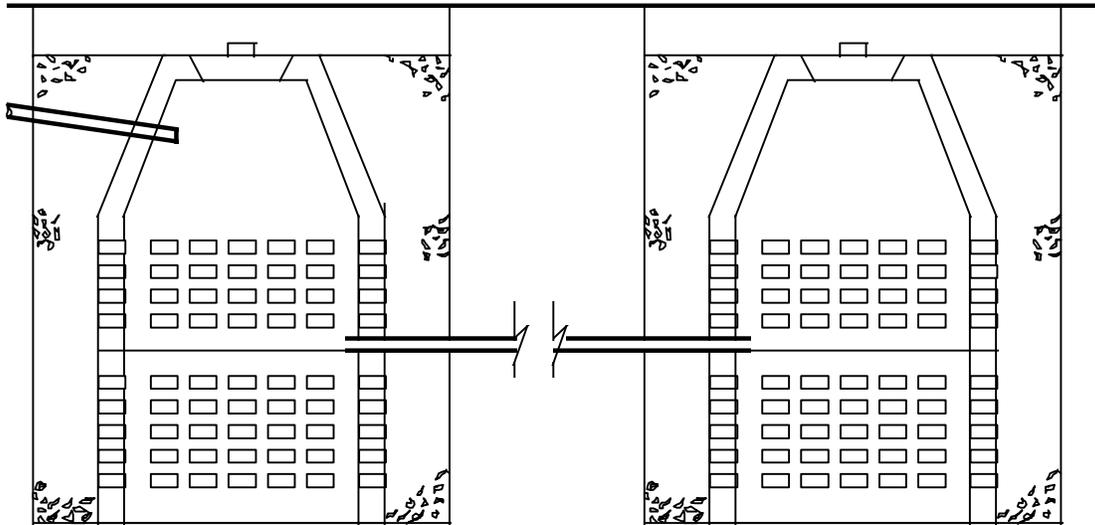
2 - Pits at Same Elevation - Connection at Mid-Depth
